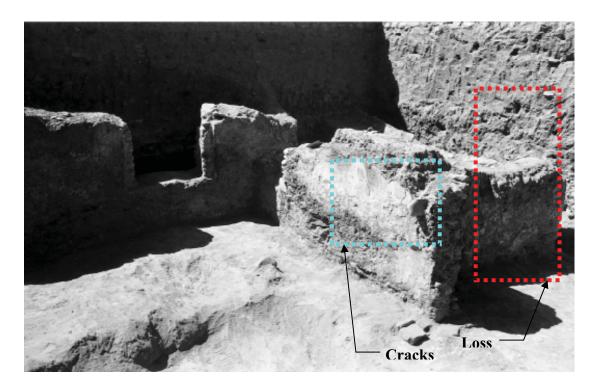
Micro cracking and general loss of plaster on wall surfaces: House One (Kidder 1956)
